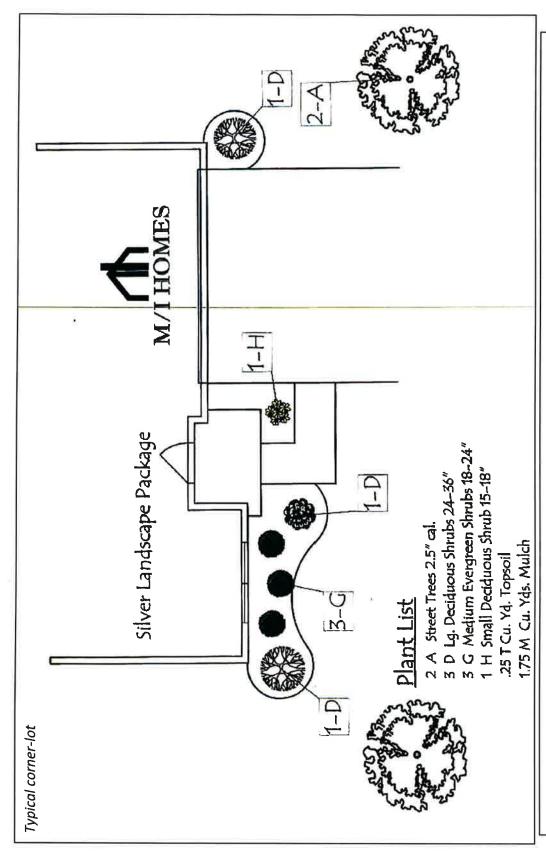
(Area A) - EXAMPLE LOT LANDSCAPE PLAN
